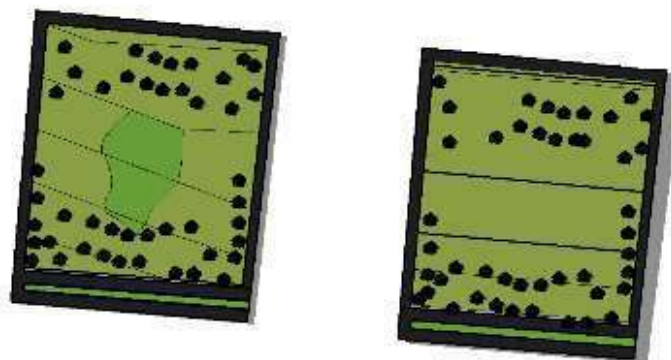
Site Plan Concept (Author's data, 2018)
